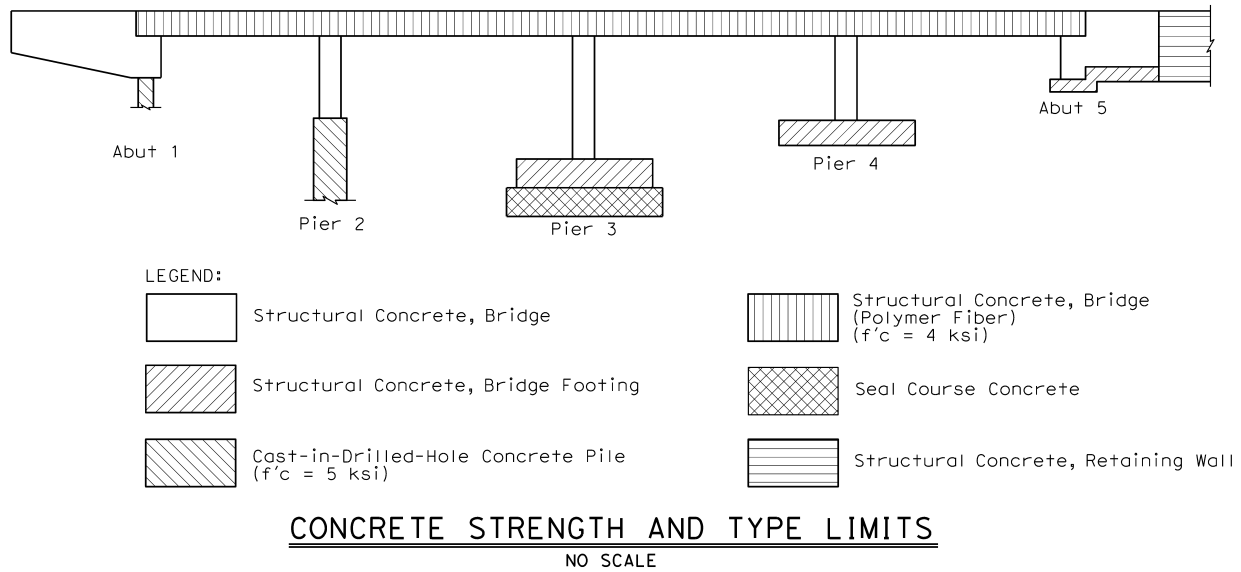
Concrete Strength and Type Limits Diagram Reinforced Concrete Slab Bridge
